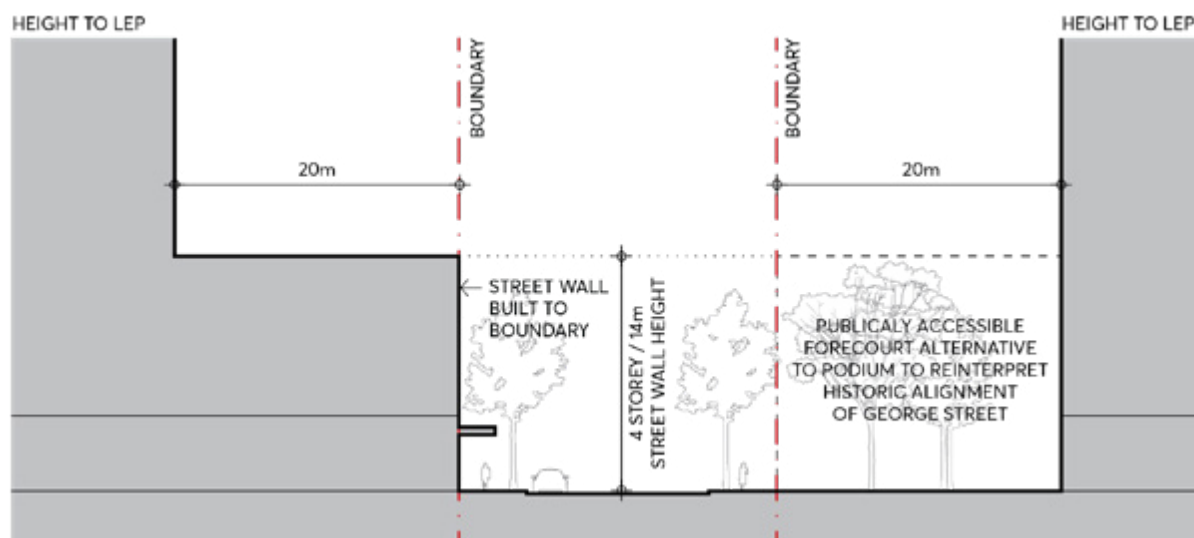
George Street west of Marsden Street – Street Wall Height and Building Setbacks
